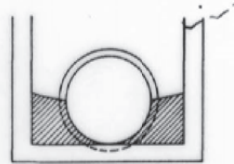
DETAIL OF BOTTOM CONSTRUCTION WHEN INLET SERVES AS MANHOLE
